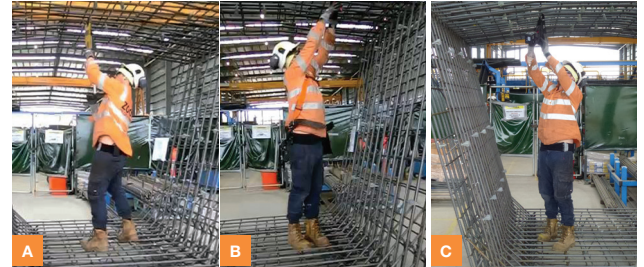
Steel-fixing overhead with different tools. The long-handled stapler tool (A), conventional pincer-cutter tool (B) and the power tying tool (C).
